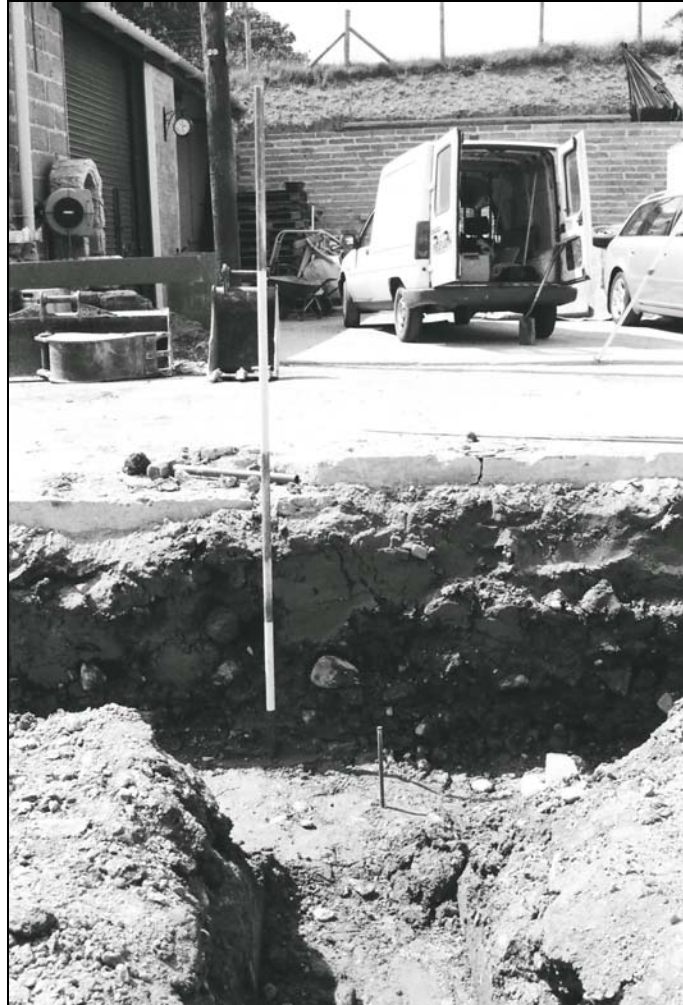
West facing view of kitchen extension trenches showing ditch cut (207) and pebble layer (209)
